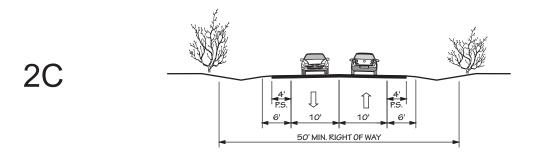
"TYPICAL" HIGHWAY CROSS SECTIONS
